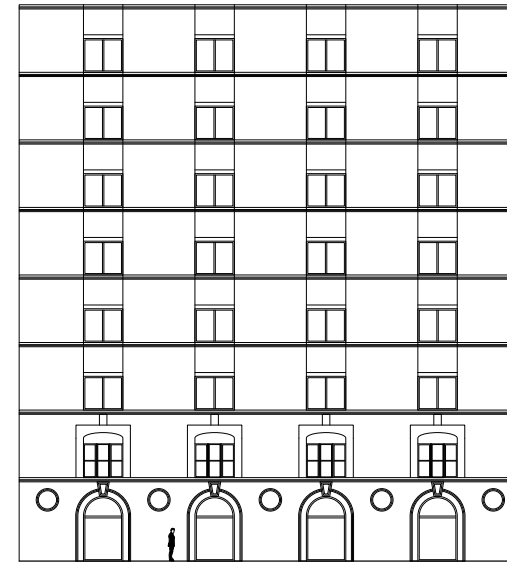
Elevation of 302 11<sup>th</sup> Avenue, a contextual and formal brick building
